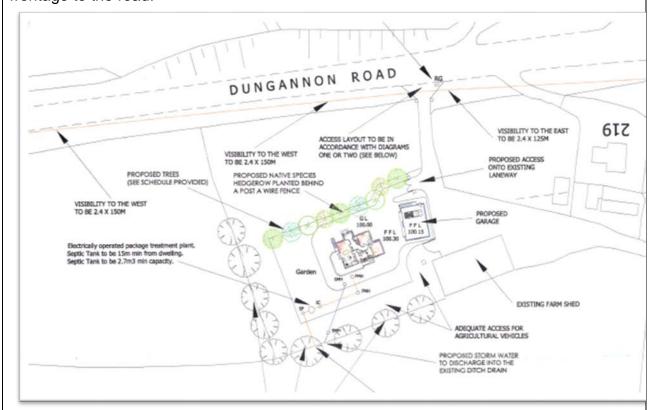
Approval for dwelling east of site under LA09/2021/0301/RM (it is considered this dwelling will not have frontage to road when works are completed).
